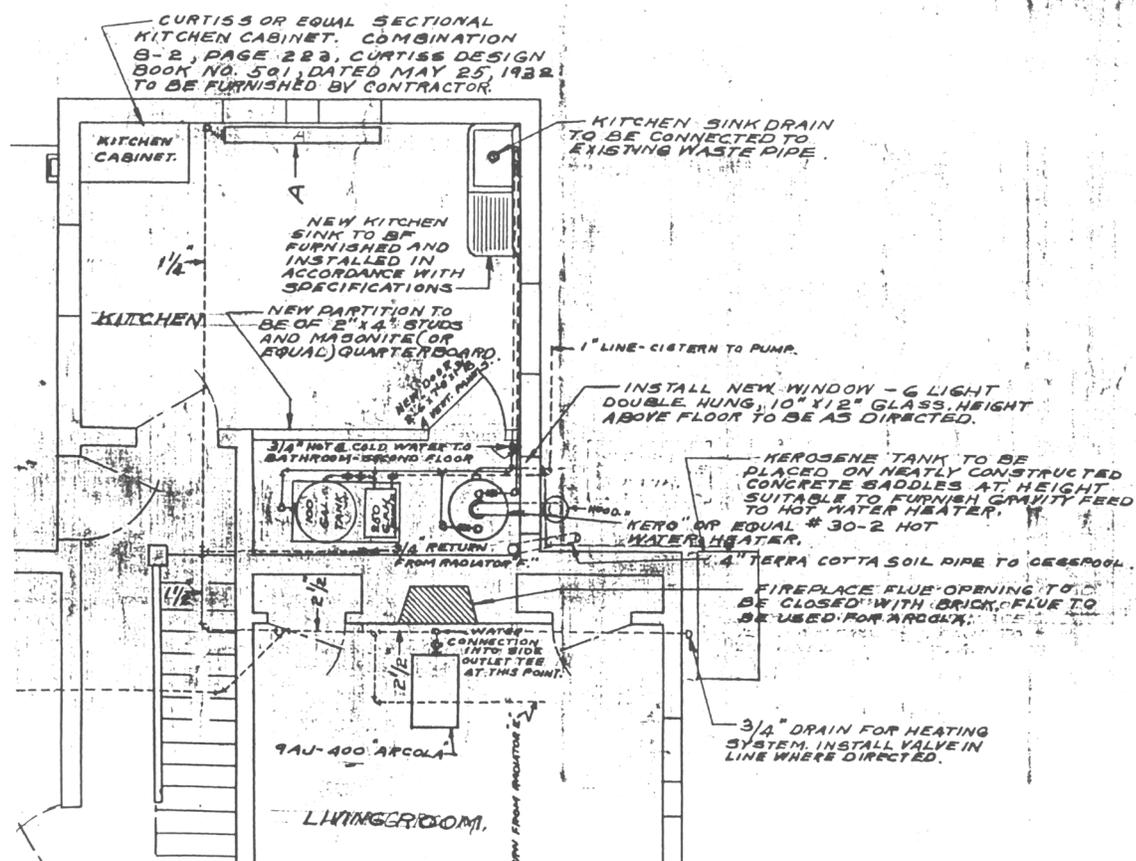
Detail of first floor showing changes for installation of plumbing and heating systems in 1934. (U. S. Coast Guard, 1934)
